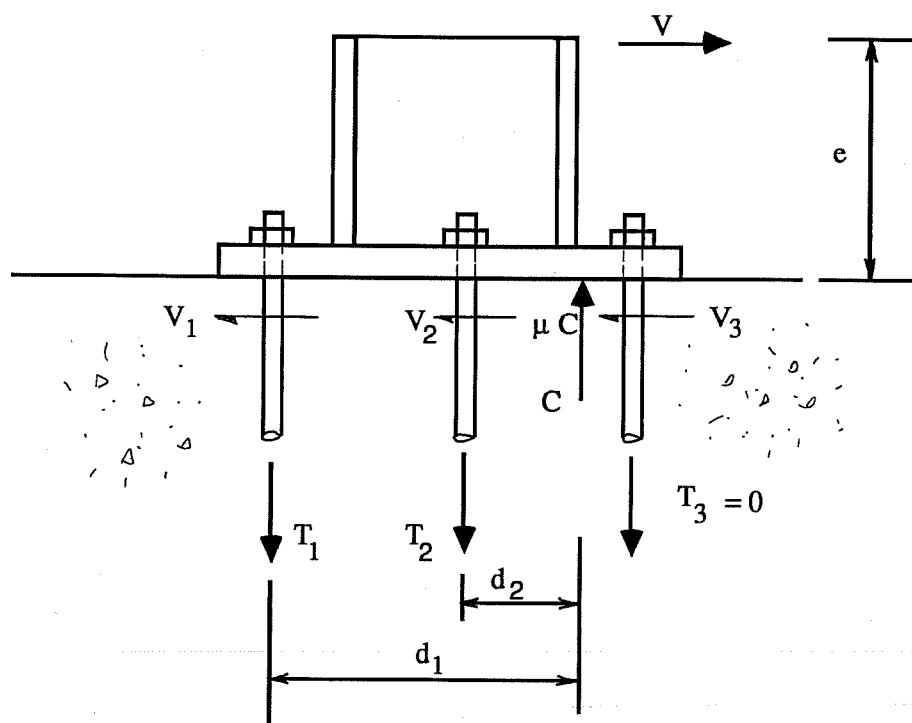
shows the forces on a typical multiple-anchor connection.
